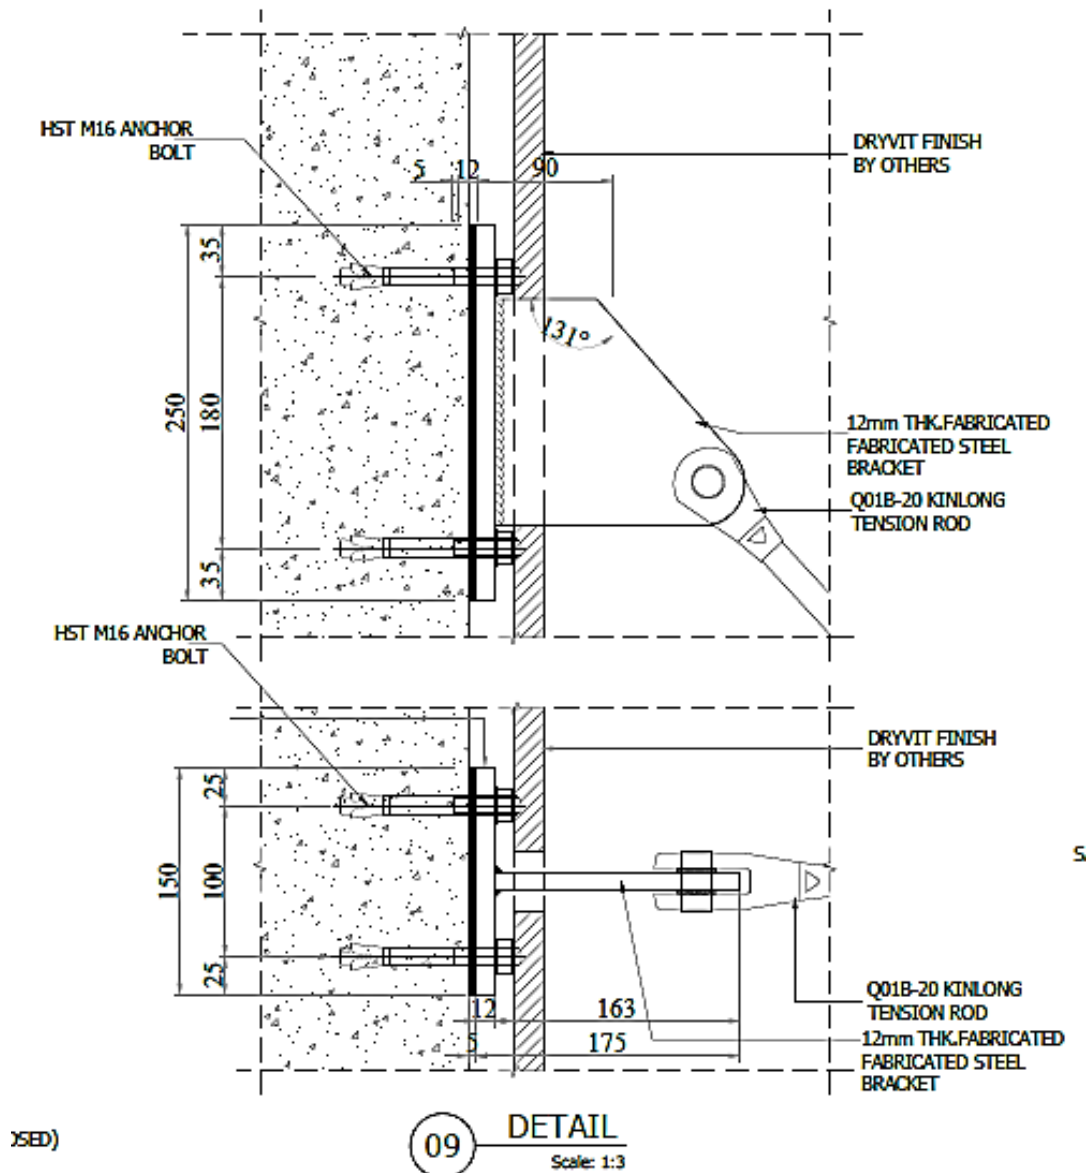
Technical detail of wall/column-mounted curtain wall connection
